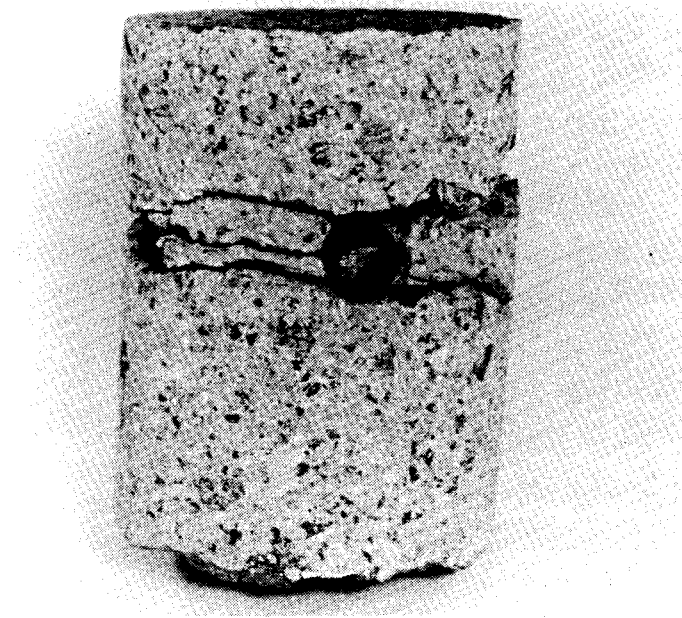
DELAMINATION AROUND REINFORCING BARS. There is no cracking on the surface.
